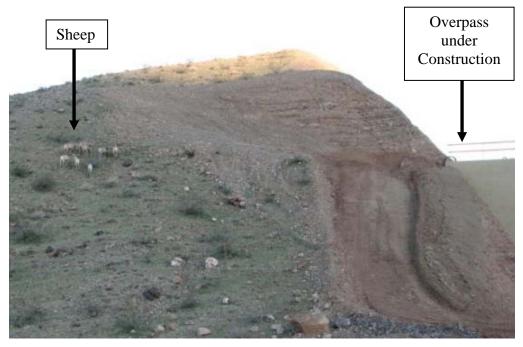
Sheep waiting for the opportunity to cross at MP 12.2 overpass. (Photo courtesy of FNF Construction).
